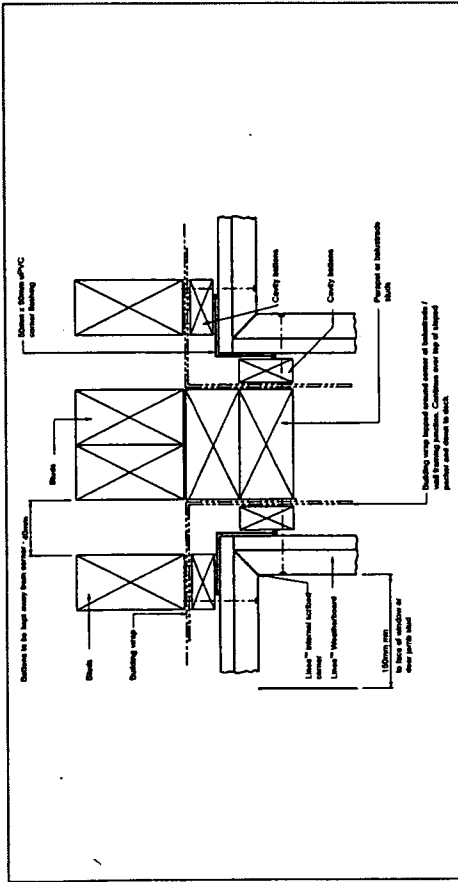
CAVITY ENCLOSED DECK BALUSTRADE TO WALL
